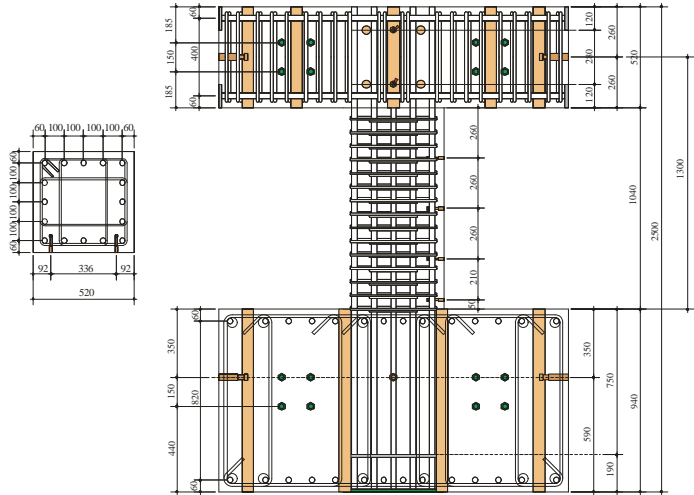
Dimensions and steel arrangement of the medium size specimens
